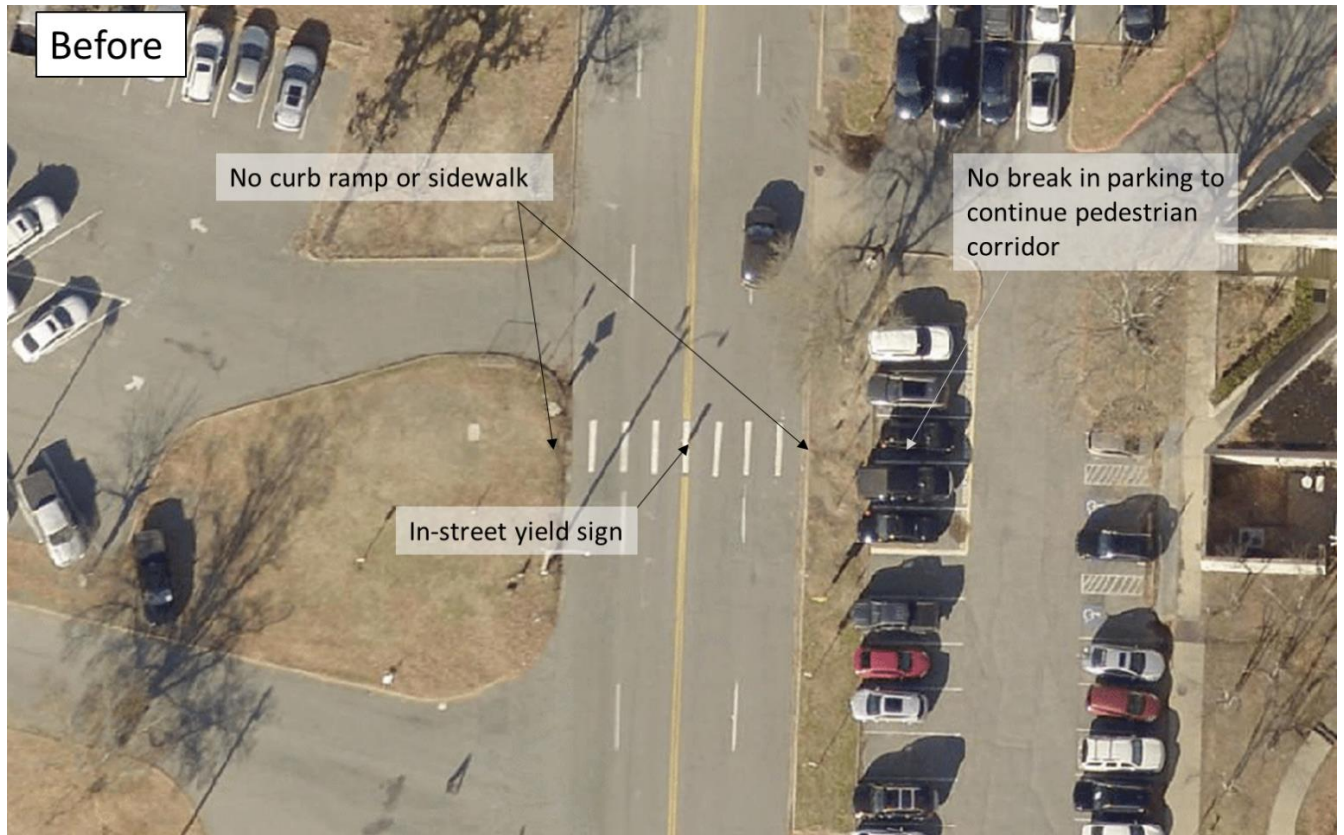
Crosswalk #3 (as defined by Fig. 1) has no accessibility. I propose creating sidewalk corridors on both sides to get to the crosswalk and a raised crosswalk instead of ramps down to the crosswalk to calm traffic.
